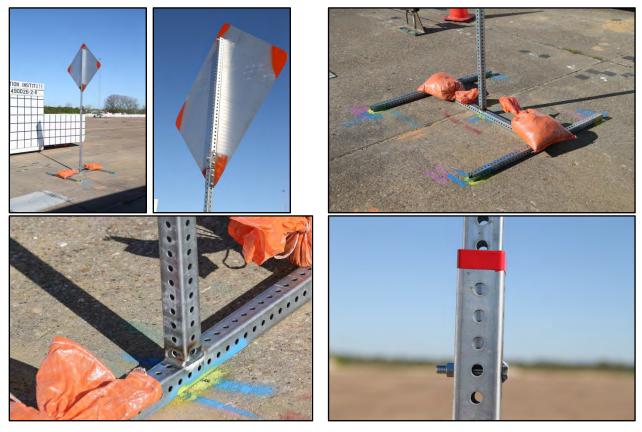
Option A Temporary Work Zone Sign Support Used for Test No. 490026-2-8.
